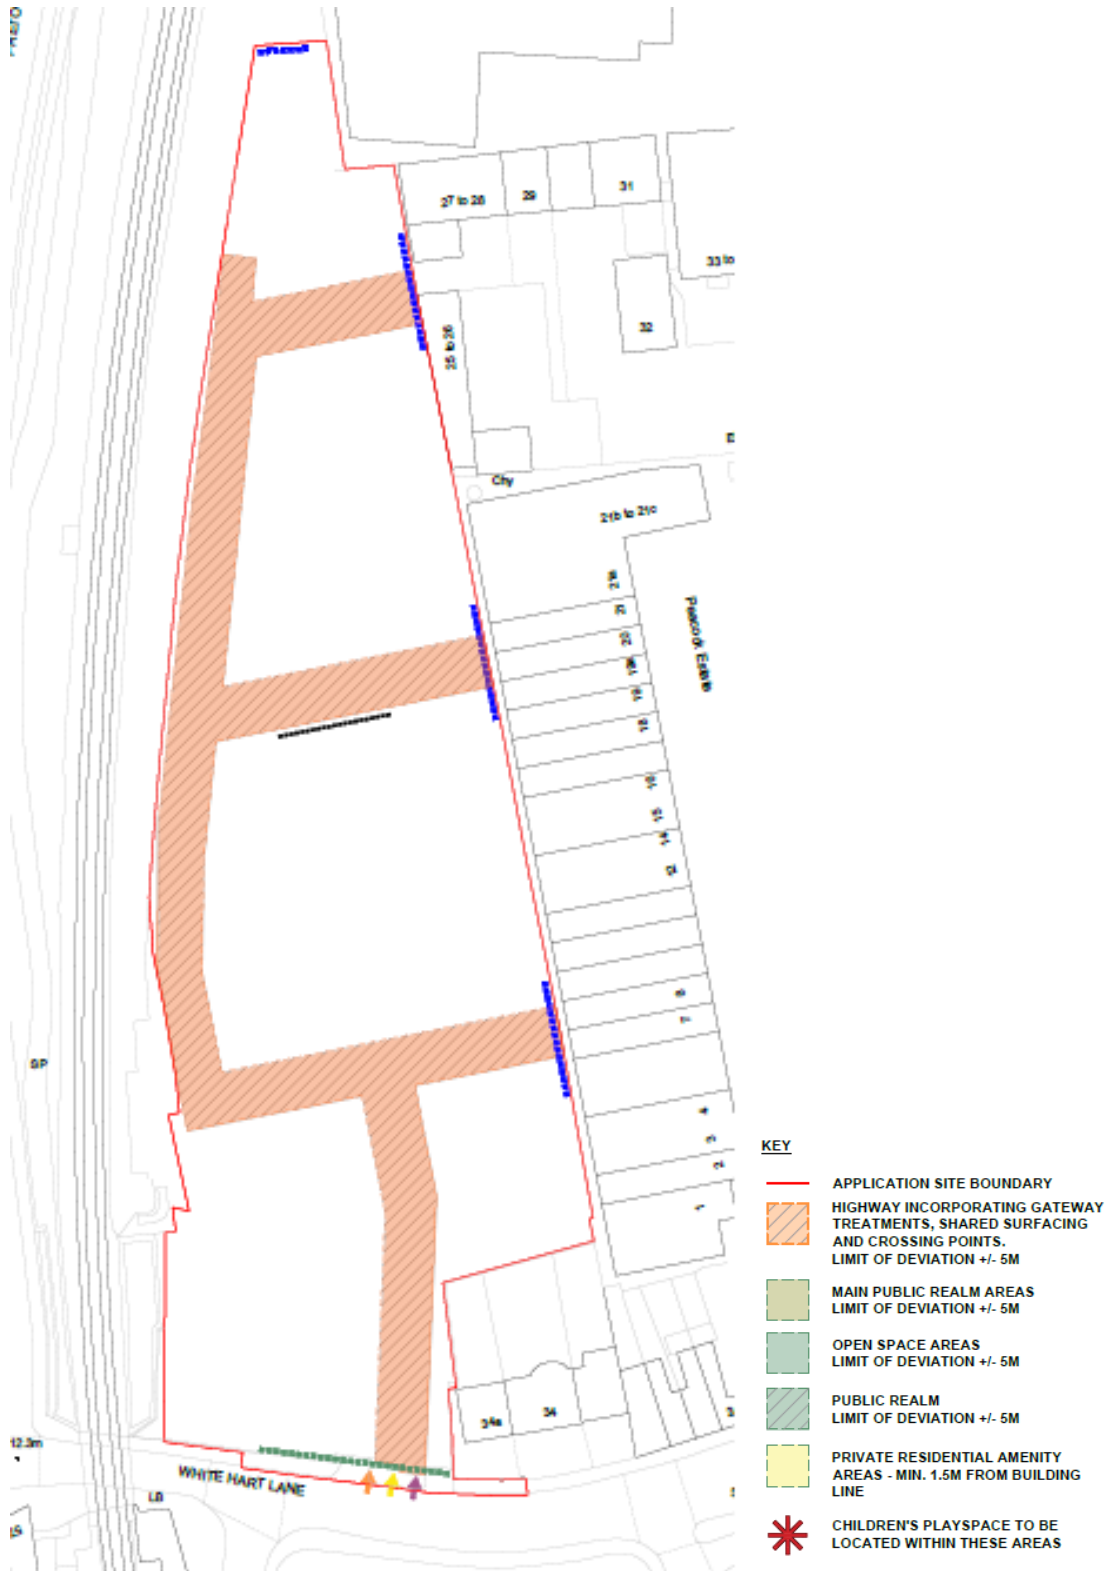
Parameter Plot Plan – Site Access (Source: Applicant)
